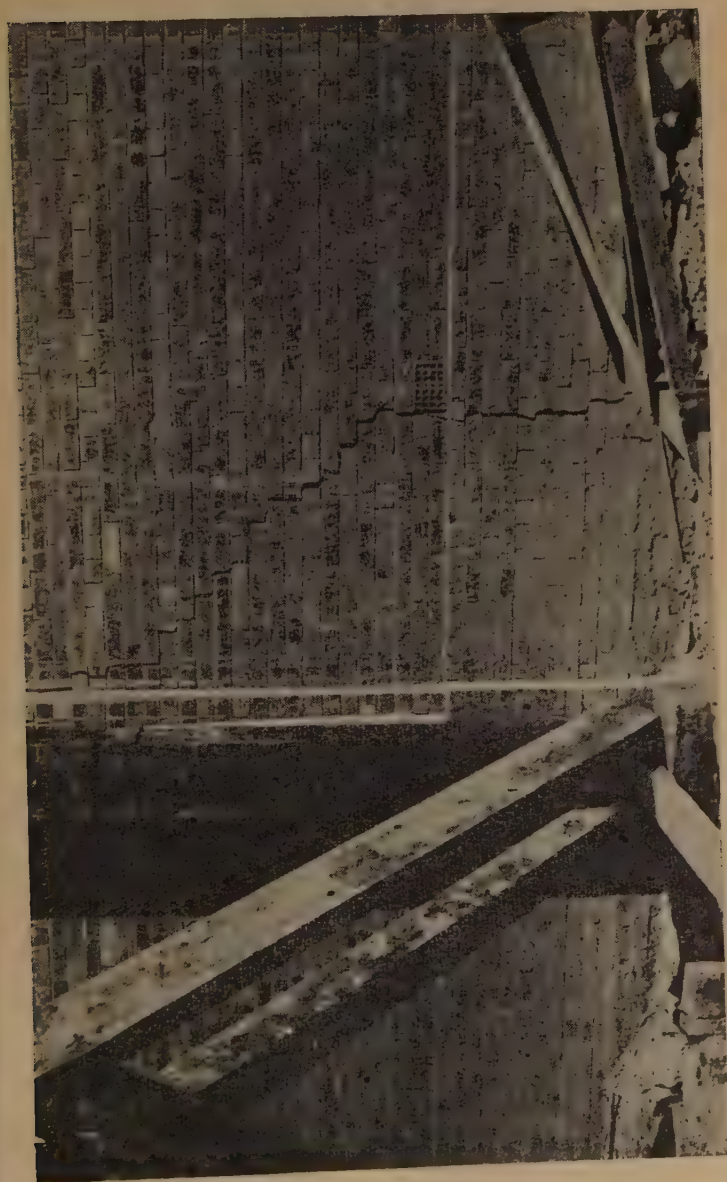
CRACK IN BRICK PANEL OF BUILDING [71] ( $\delta/l = 1/240$ )
